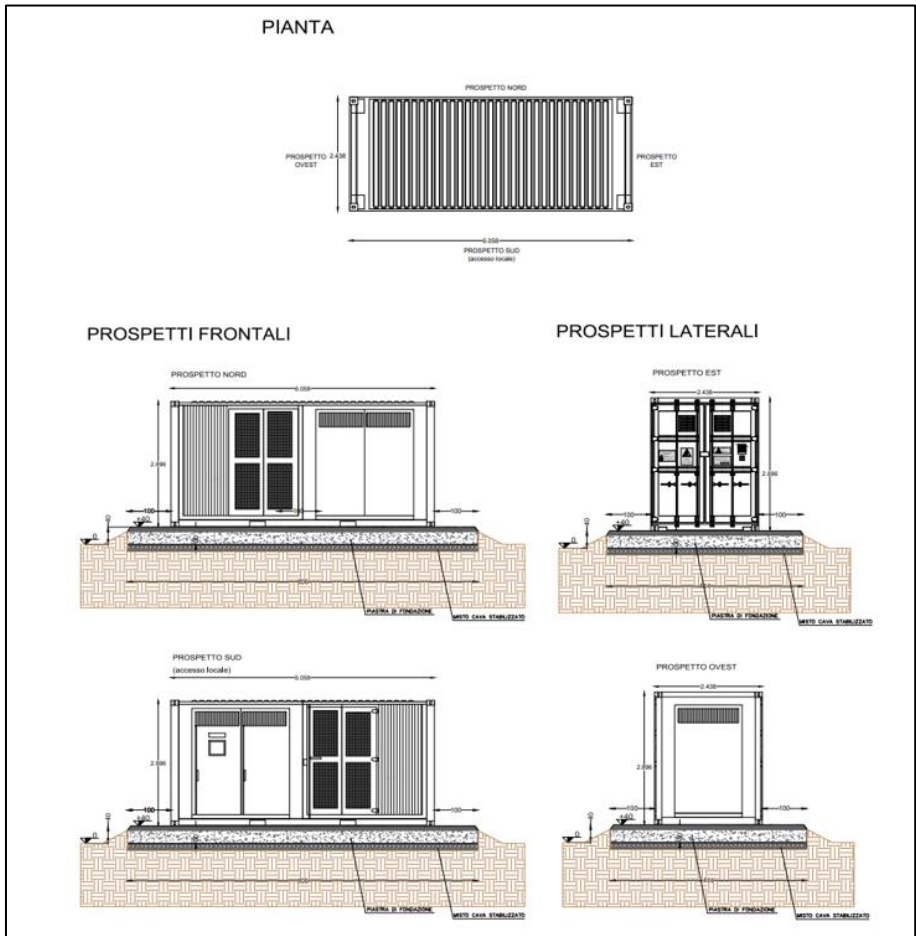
Extract of table "Detail of the power station (plans and elevations)"
